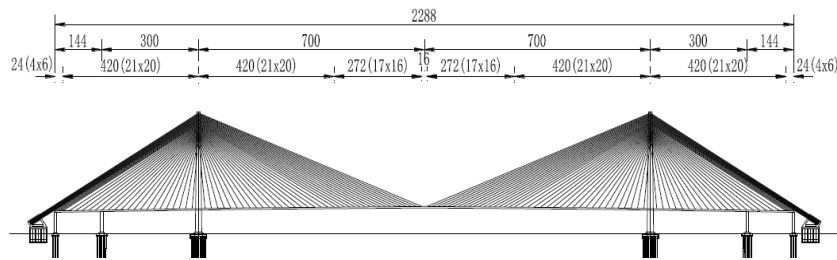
1400m partially earth-anchored cable-stayed bridge (unit: m)
